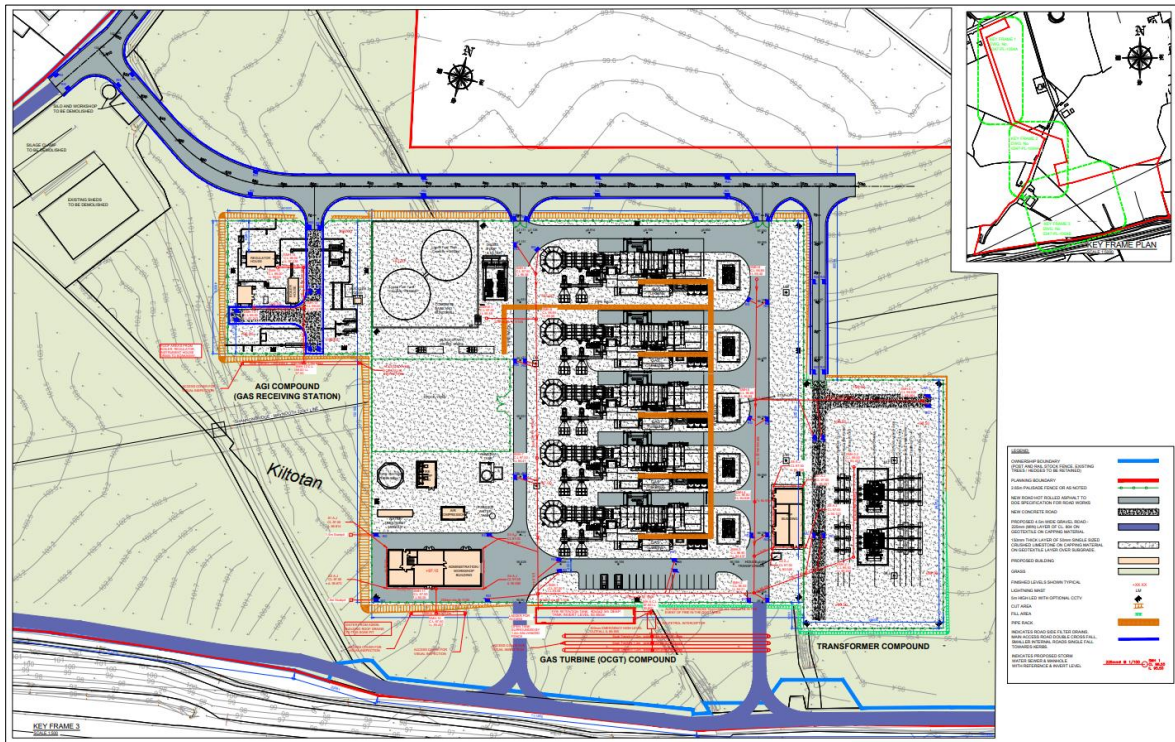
LEL Flexgen Castlelost Project Drainage Layout
